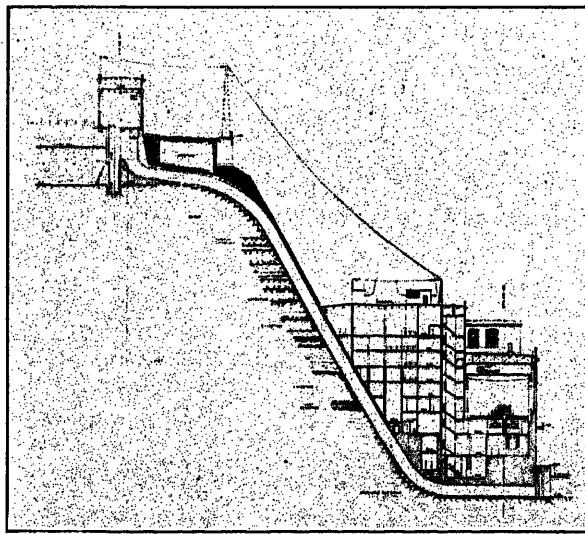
CROSS-SECTION OF POWER HOUSE NEAR SOUTH END
